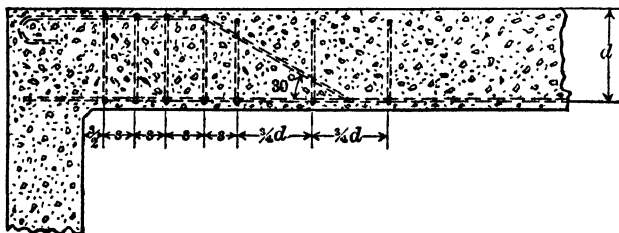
Diagram of Web-Reinforcement in a Rectangular or T Beam
